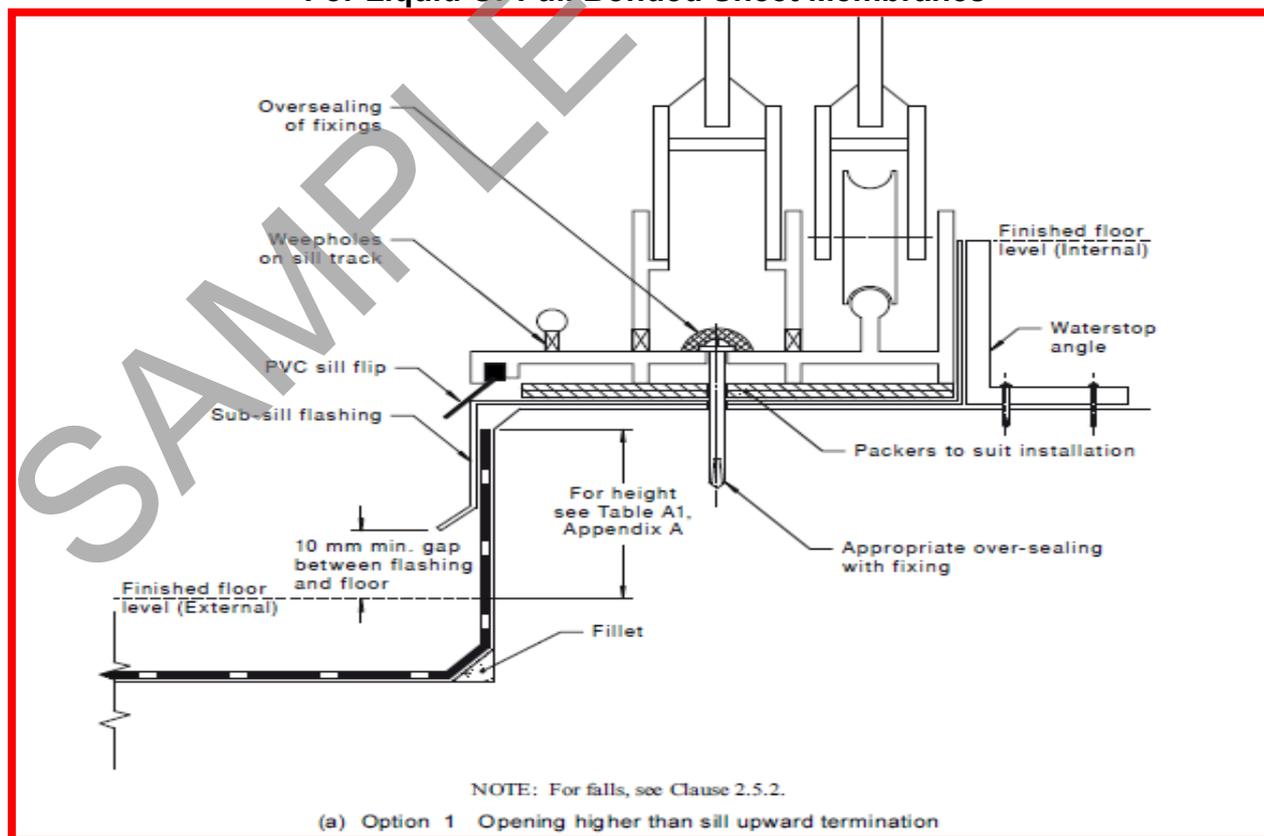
Figure 2.8 (in part) Typical Details Of Membrane Termination At External Opening Doors.
